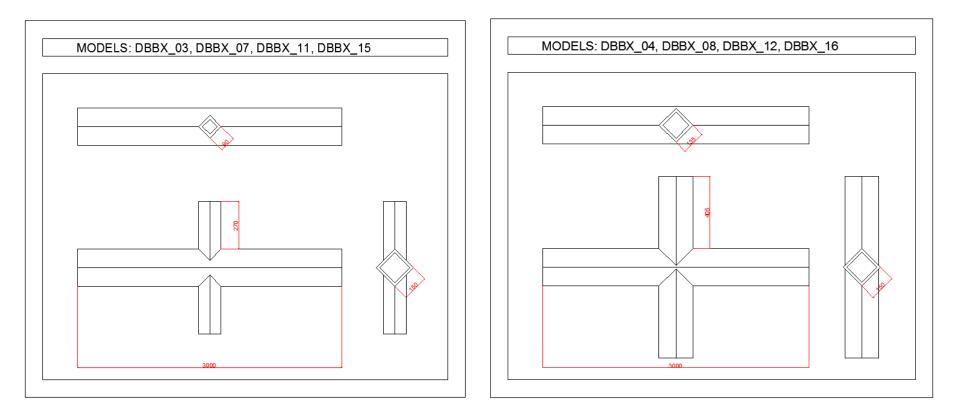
Geometry of models. Brace widht of 90 mm (left) and brace width of 135 mm (right)
